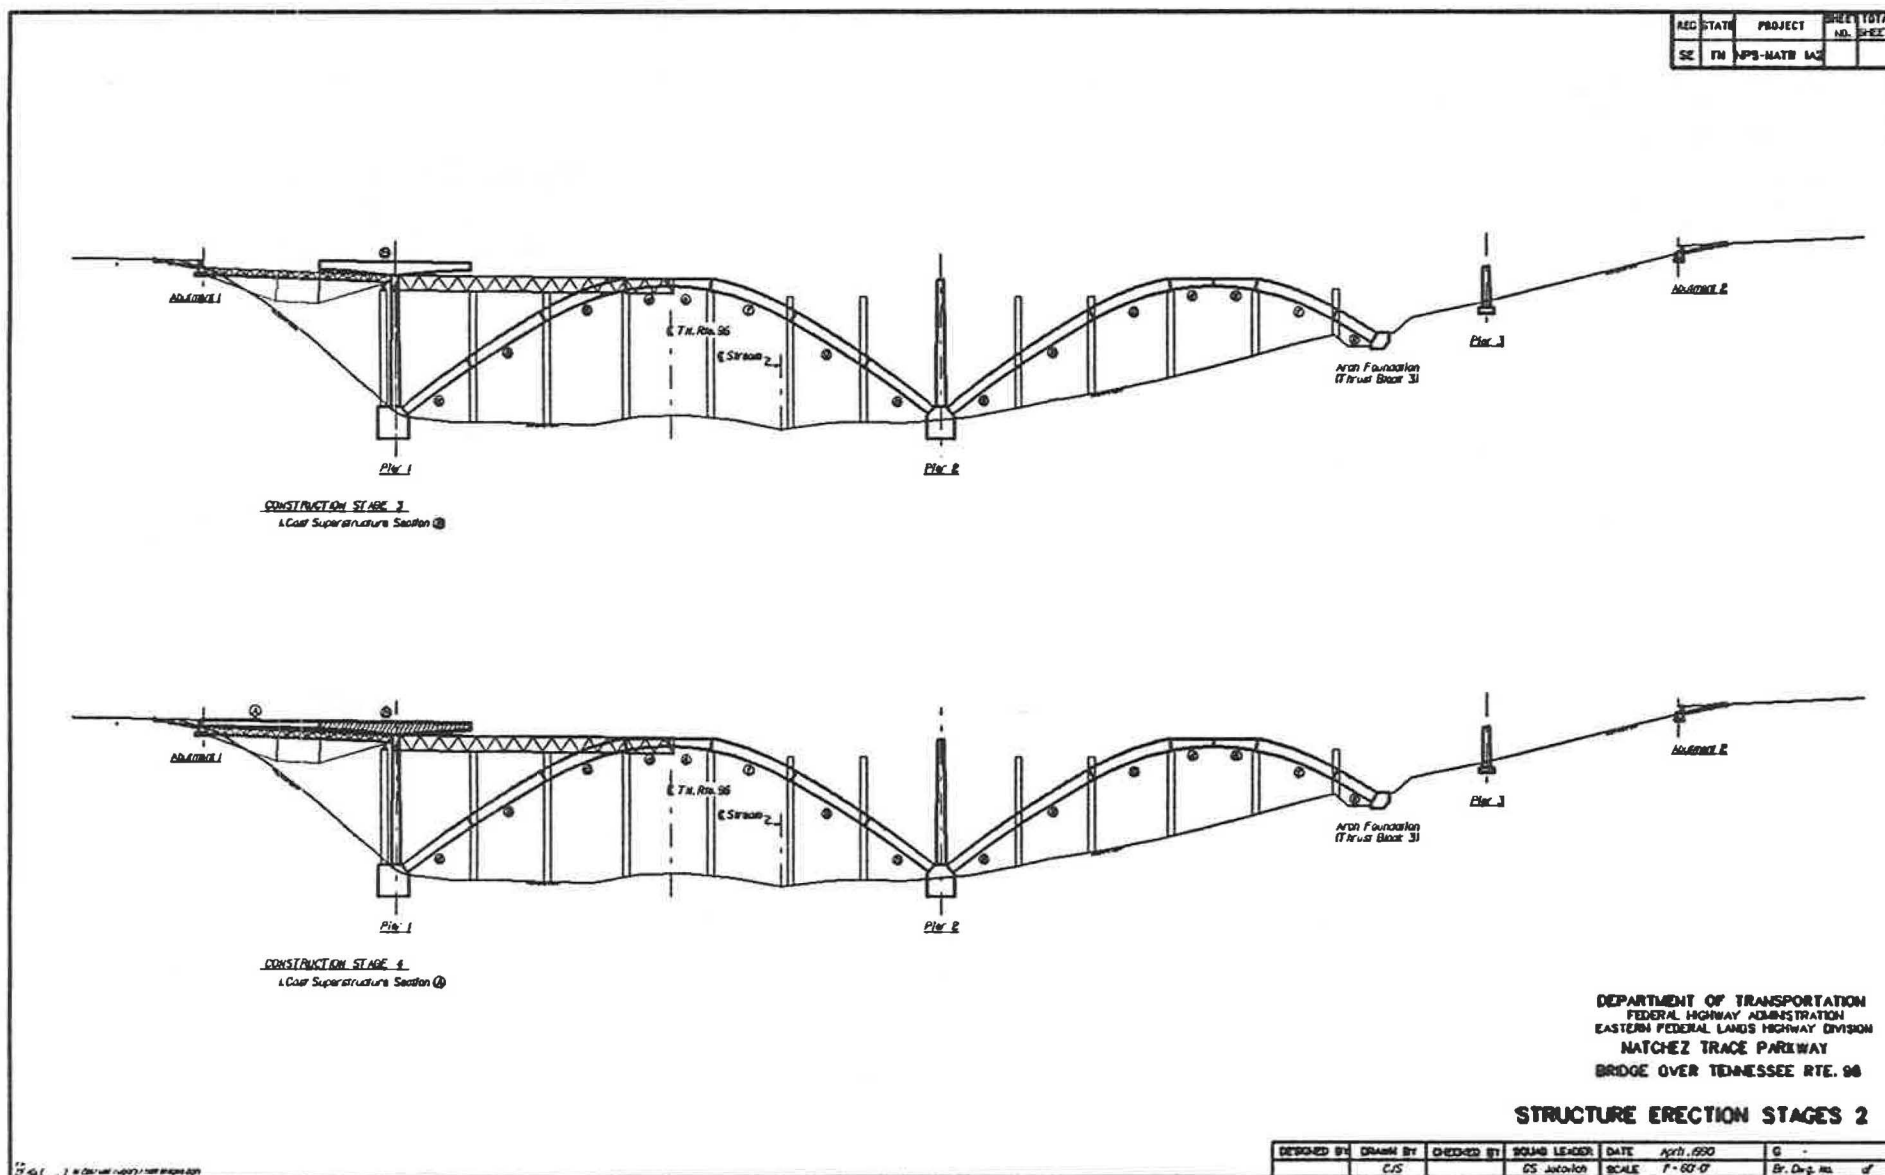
Construction stages 3 and 4 showing span 1 and span 2 cantilever placement
